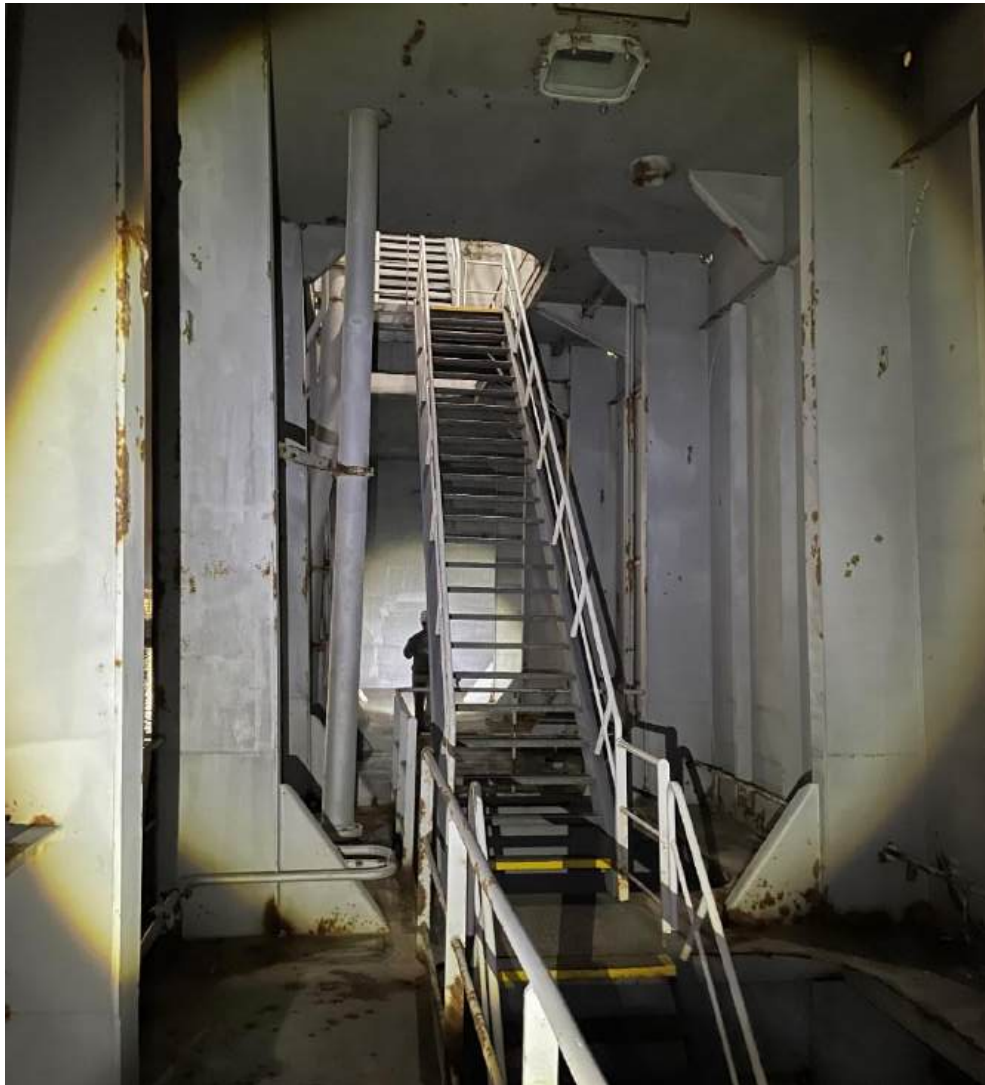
Typical condition of open portal structure and stairwell (Port Aft shown)
